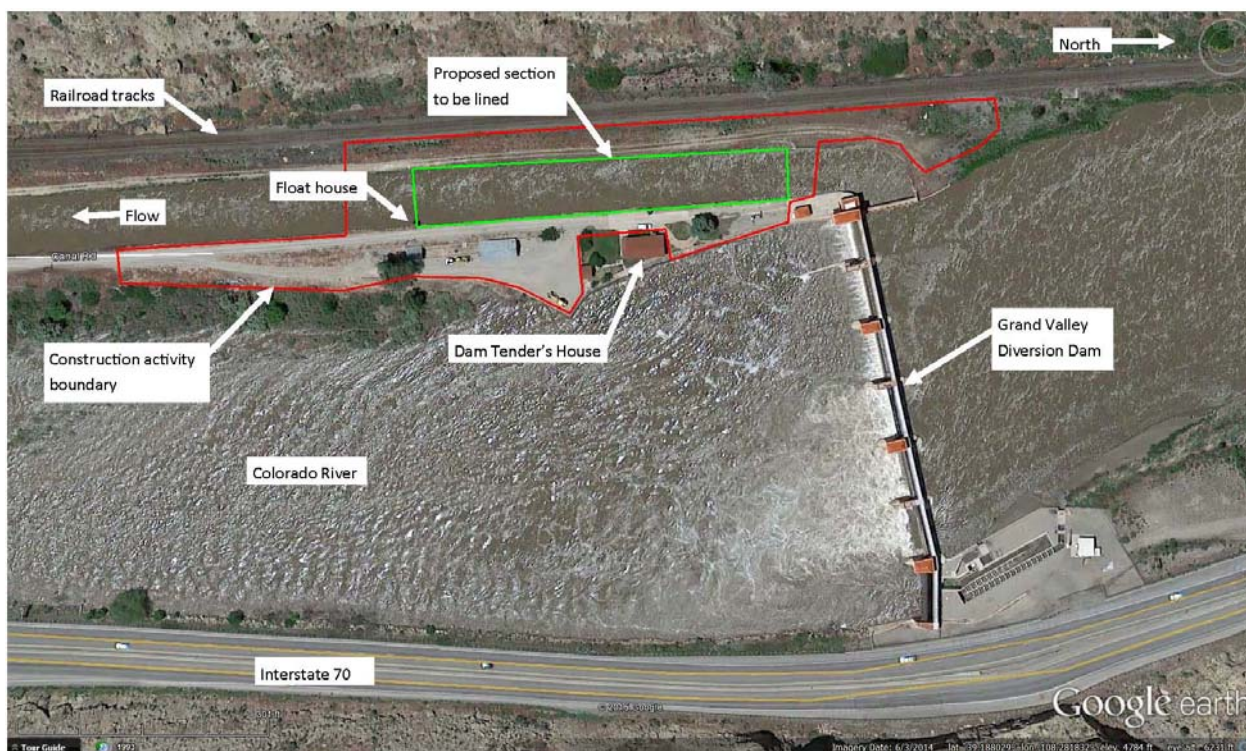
Aerial View of the Roller Dam (Grand Valley Diversion Dam) and Top 500 Feet of the Canyon Canal to be Lined.
